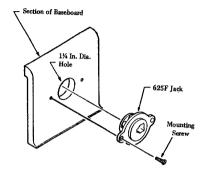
Baseboard Mounted 625F Miniature Jack
